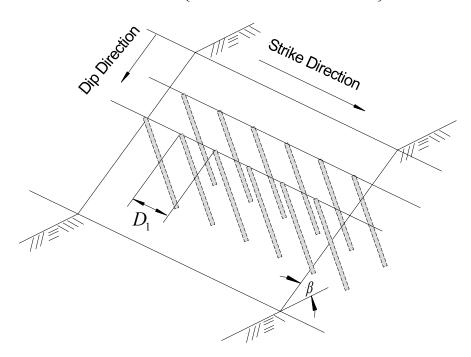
Slope reinforced with a single row of reinforcing members spaced equally in the longitudinal (strike) direction.
